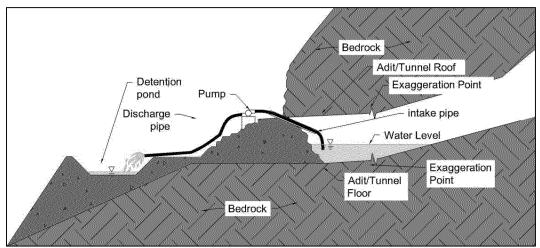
Cross-section illustration showing step 4 of the plan (not to scale). An intake hose from a pump is inserted into the steel pipe. The pump discharge is taken to a small pond constructed on the waste rock dump. Water from the adit is pumped down. Not shown on this illustration is that the water in the small pond would be continuously removed by another pump and sent to treatment elsewhere on the site.
